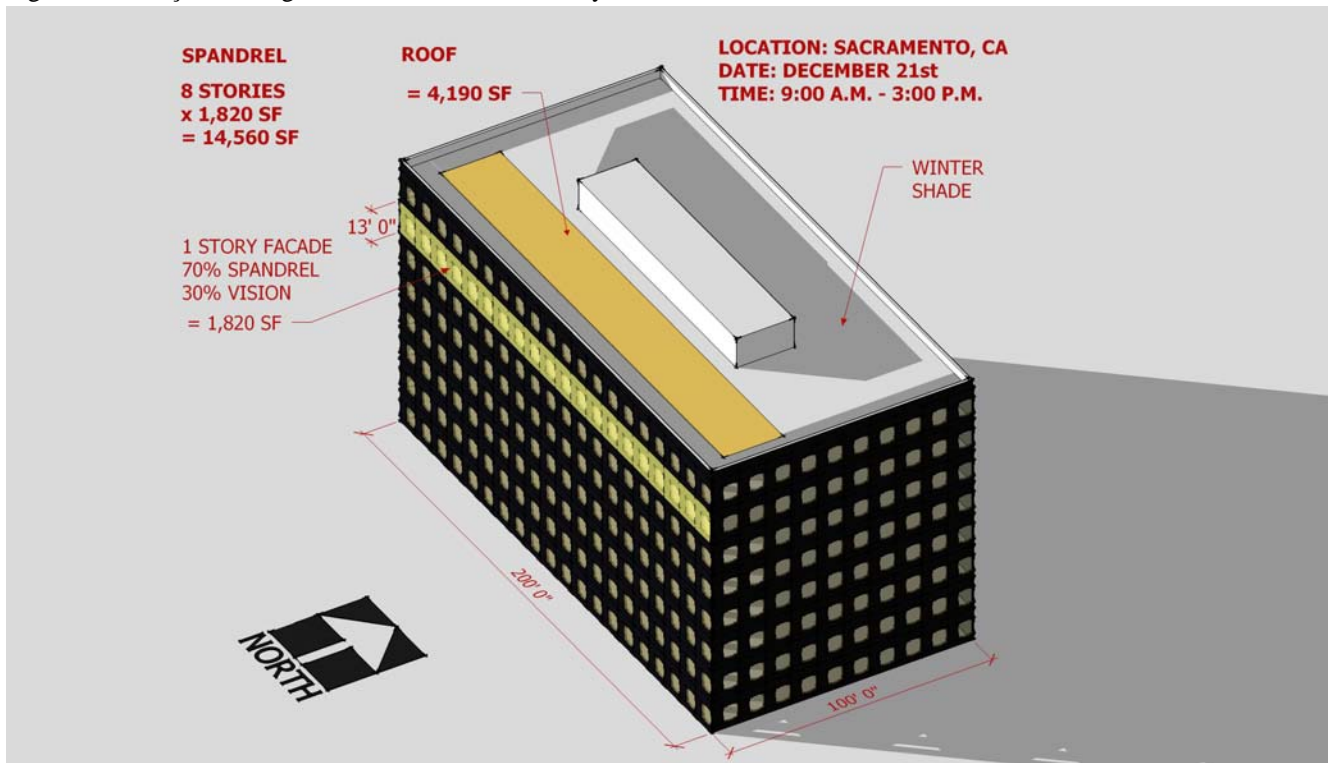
Illustration comparing potential PV area for roof and façade applications on an 8 story building
